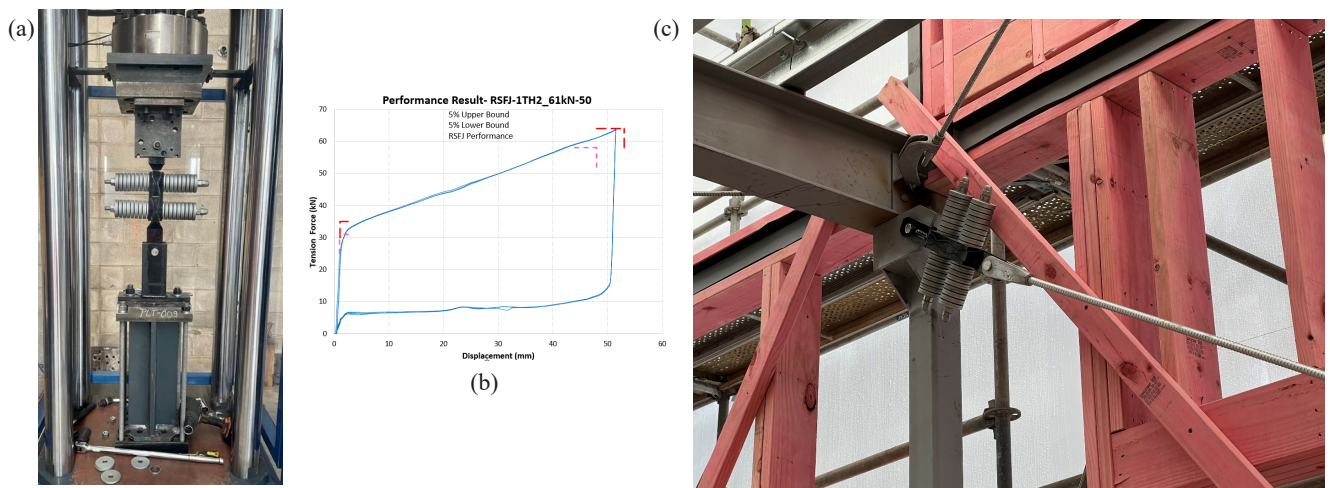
Production testing and installation of the RSFJs: (a) test setup arrangement (b) load-deformation behaviour (c) installation on site
